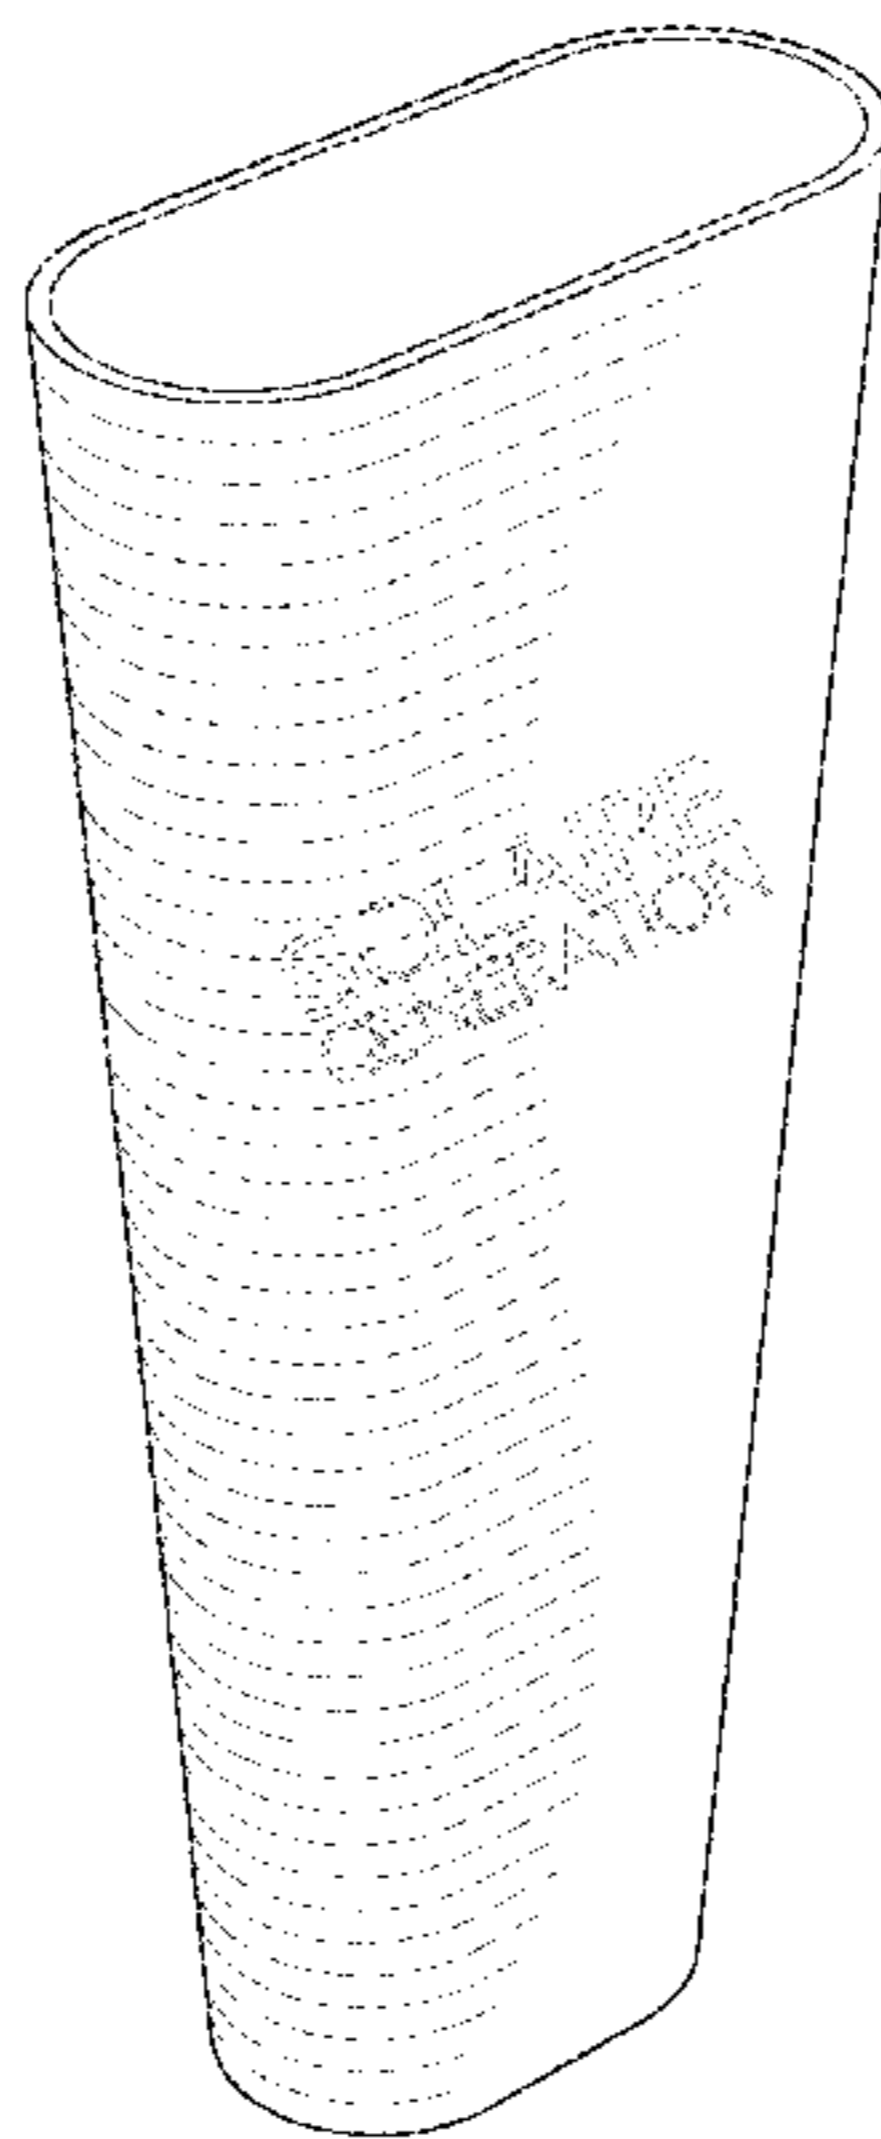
is a left side elevational view of the column cover shown in FIG. 2, where the column cover is positioned around a column.
